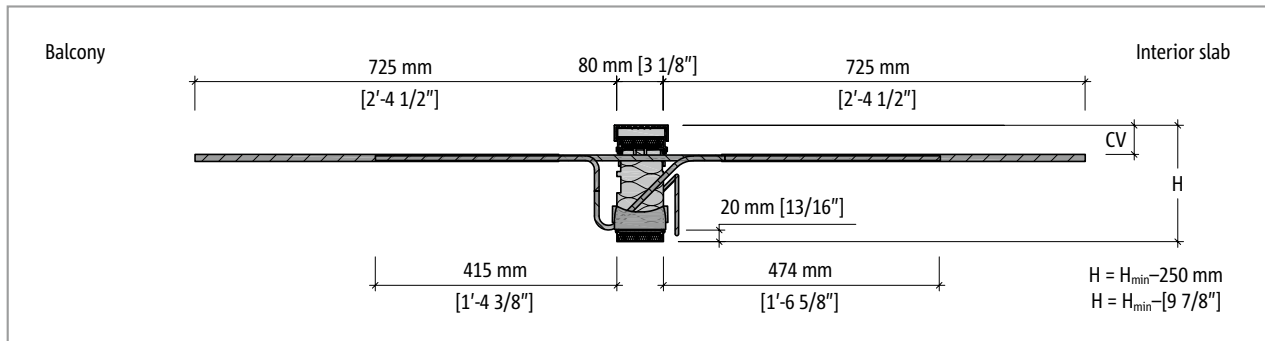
Schöck Isokorb® T Type CK-M6-V3 to M11-V1: Product cross-section
